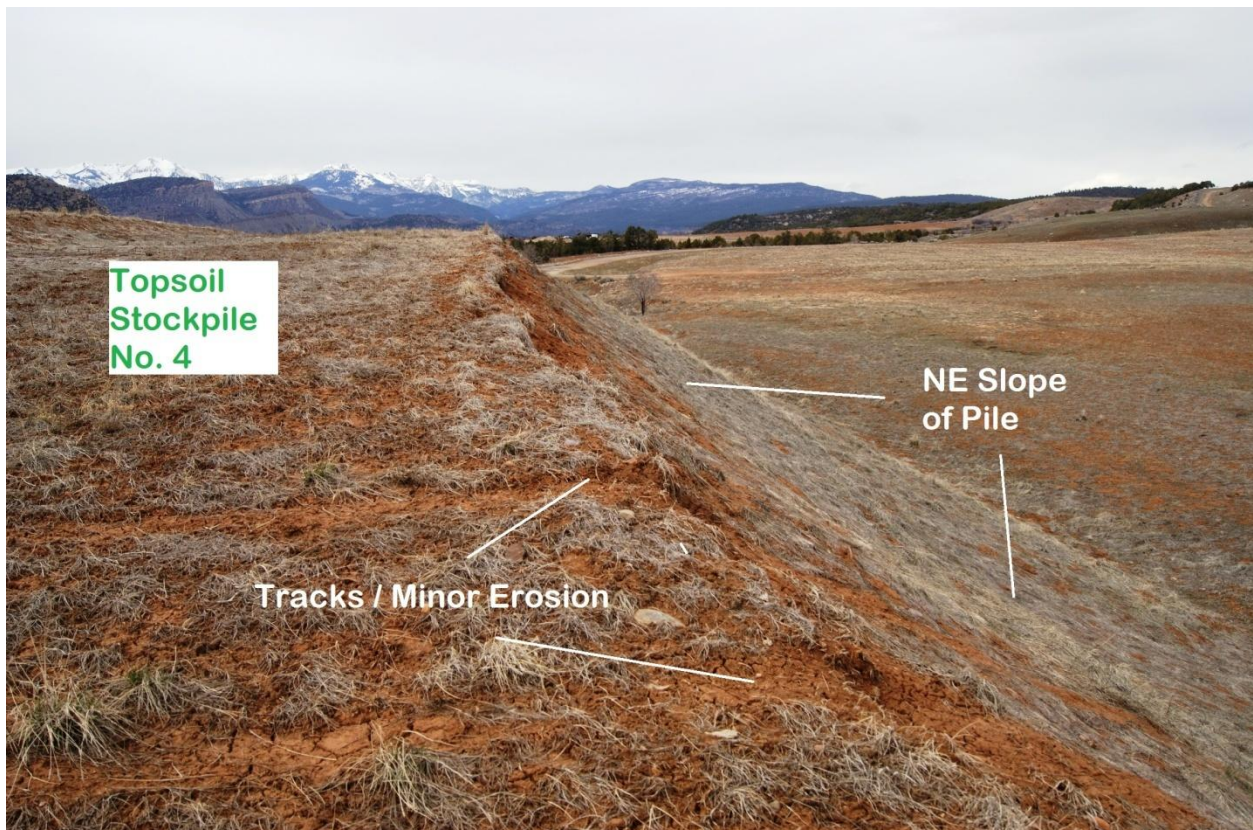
Slope break and tracks/erosion on northeastern flank of Topsoil Stockpile No. 4
